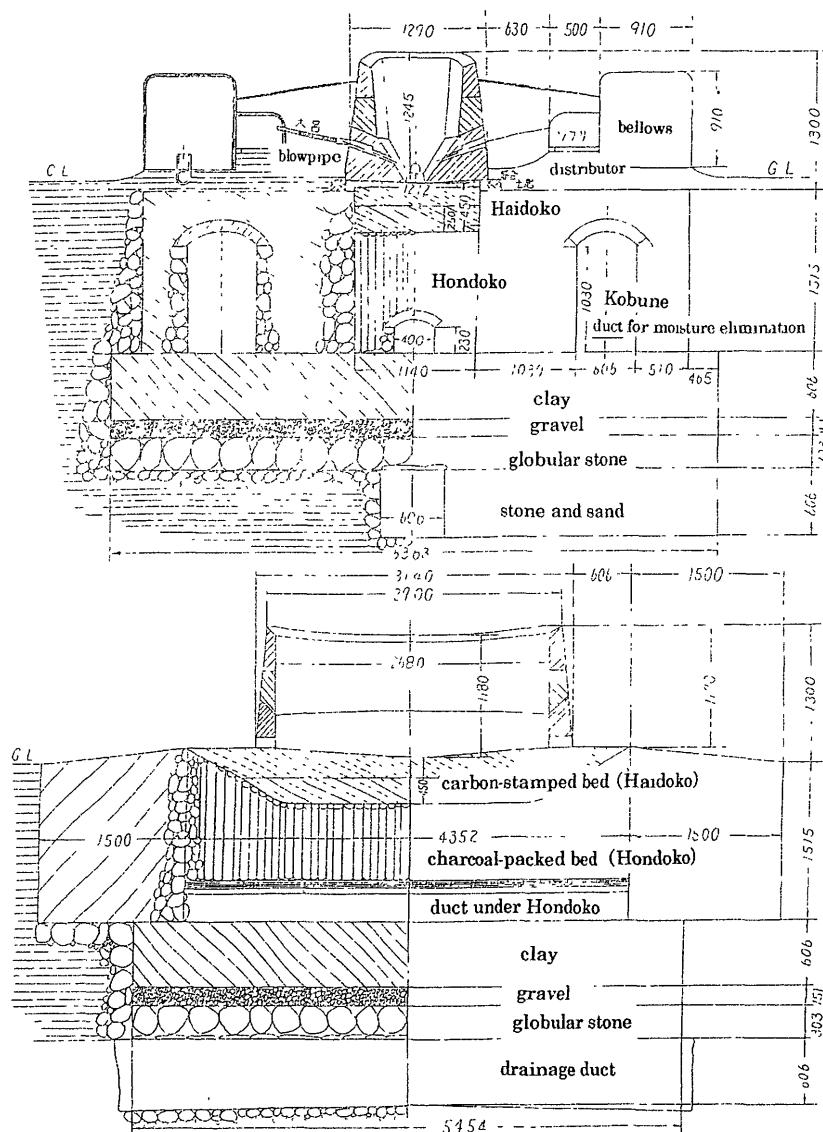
Tatara furnace and its underground construction¹⁵⁾
